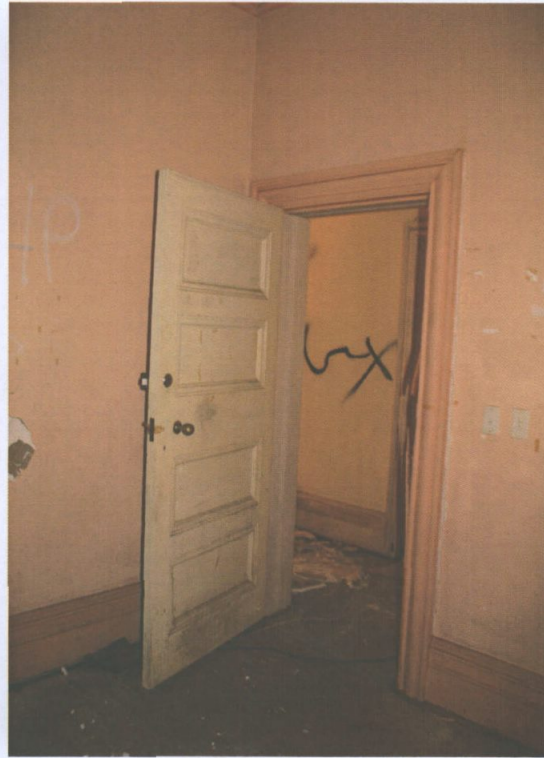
Room 14 facing northwest. Note the early door. Paul Davies 2014.
